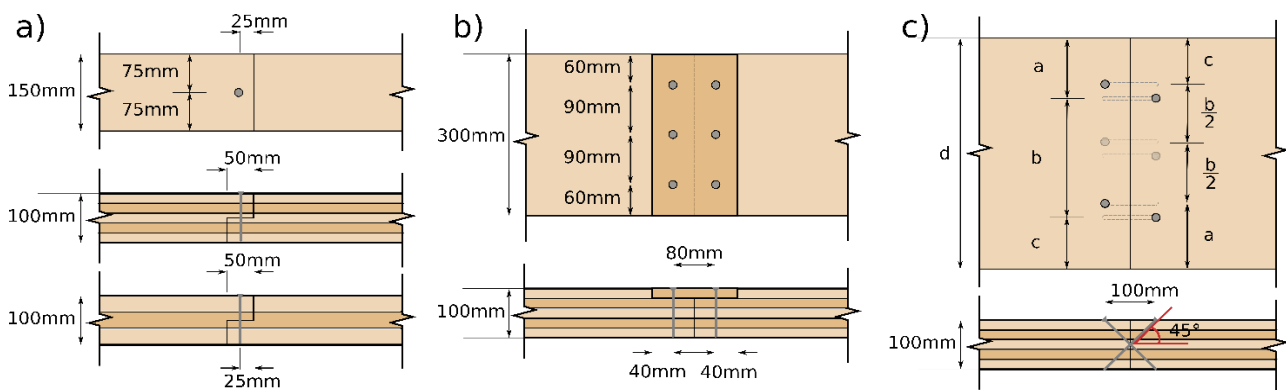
Joint types: a) half lap joint; b) single surface spline; c) butt joint
